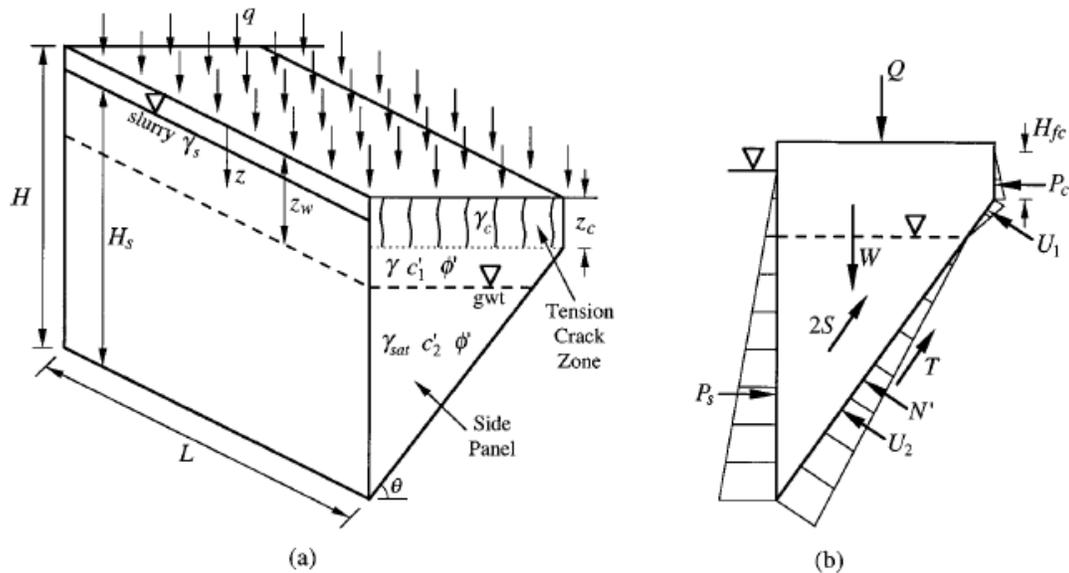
Geometry (a) and forces (b) on a failure wedge into a slurry-supported trench with a tension crack above the groundwater table (after Fox 2004, with permission from ASCE)
